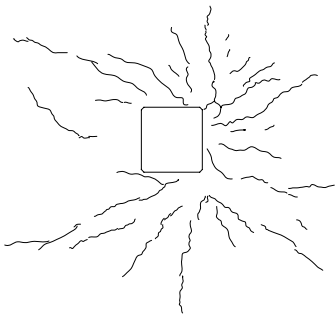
Level 3-2A and 2B Top of Slab Cracks (North 0.4% Roof Drift)
